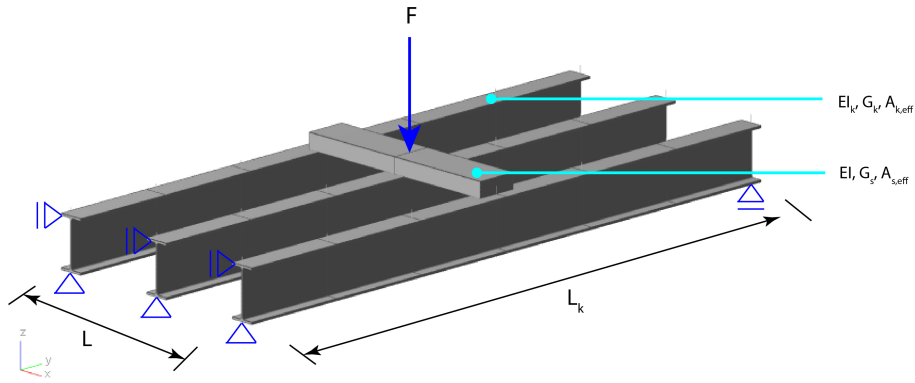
Sketch of three longitudinal girders with one deck beam loaded by a concentrated force 'F'
